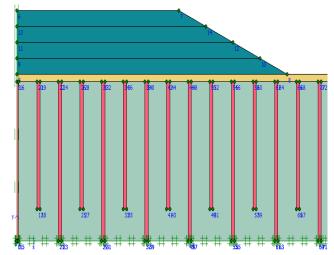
Installation of stones column in soft clay foundation (Plaxis model)
